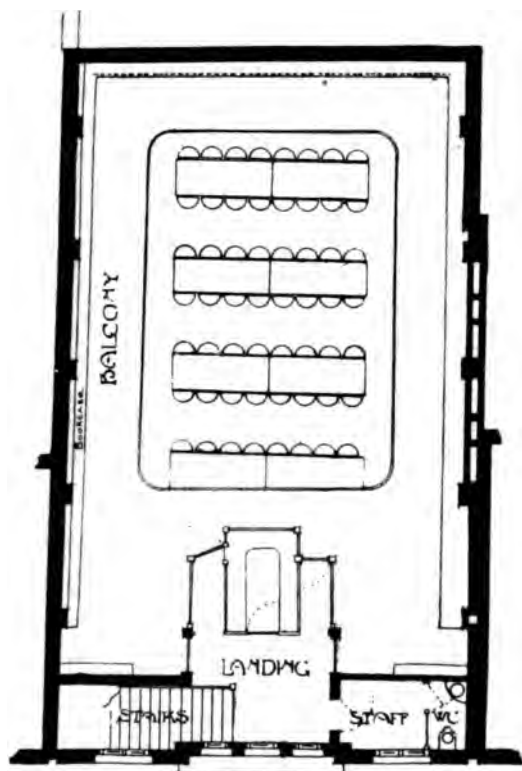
Fulham (North) Library Plan showing Open-access Lending Library on First Floor and Reading Room, through Well, on Ground Floor (Section 117).
